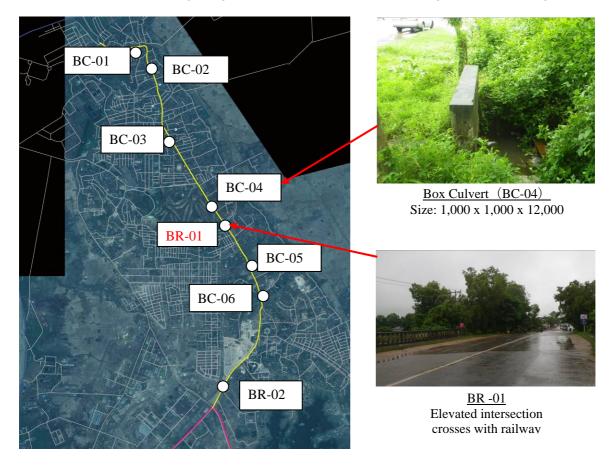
The Locations and Conditions of the Existing Box Culverts and Bridges
